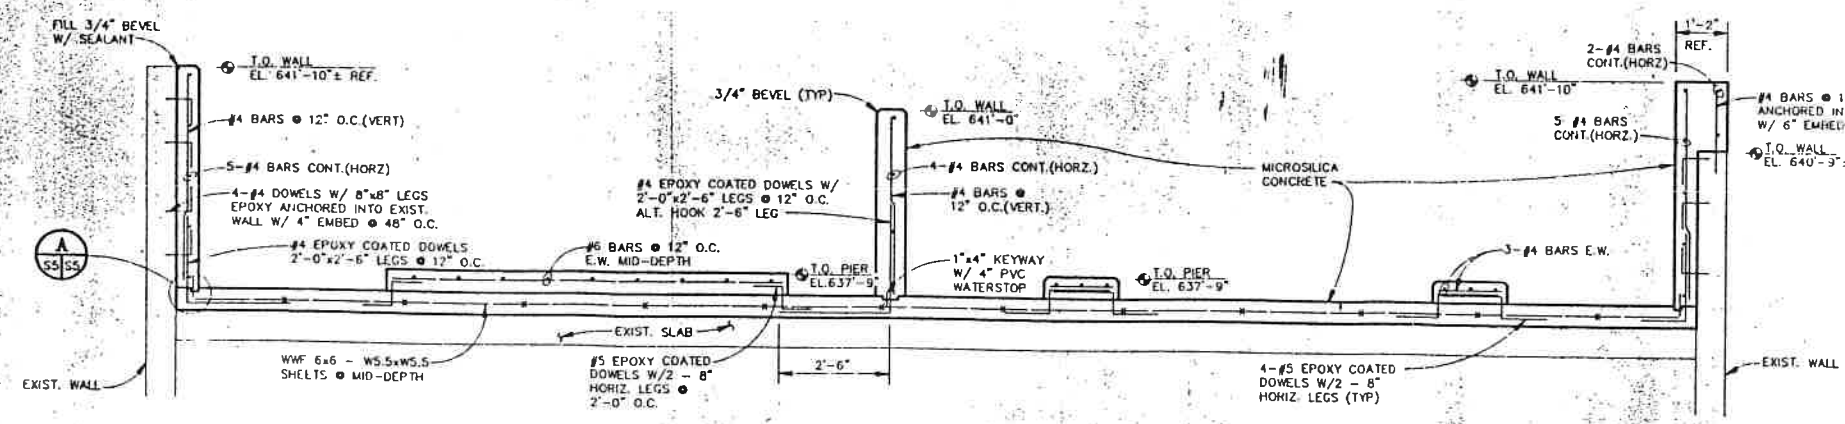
DETAIL B (TYPICAL 14 LOCATIONS)
